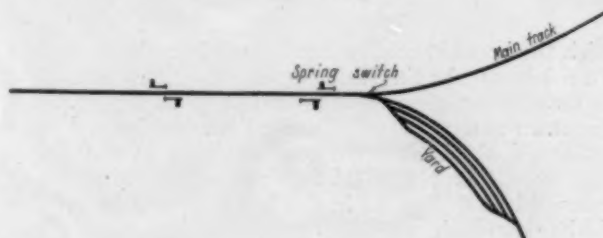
Track Layout at Ames, Ia., Where Spring Switch Is Used at the End of a Yard
